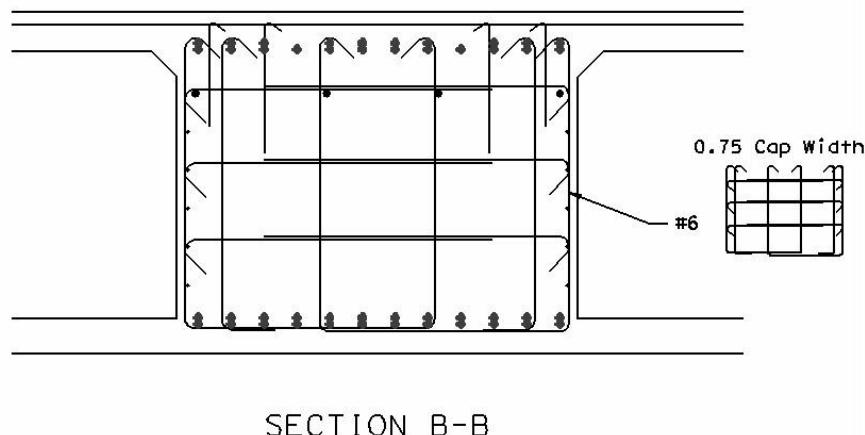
Joint Reinforcement Outside the Column Region
